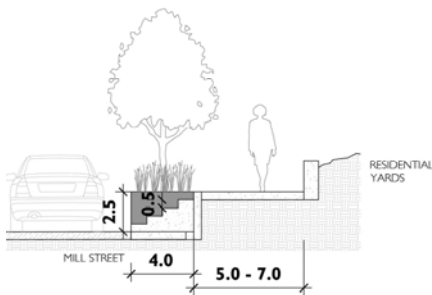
Mill Street Sidewalk Improvement: Alternative C
